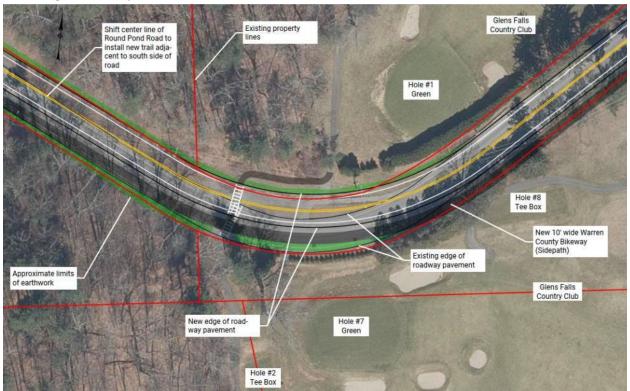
Concept of Sidepath on South side of Round Pond Road.
